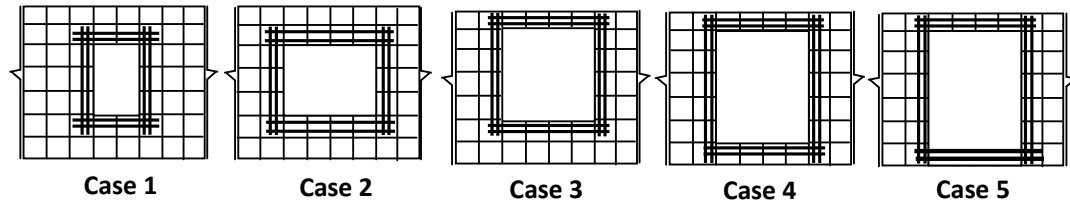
Ductile detailing (strengthening) around openings for a typical storey
